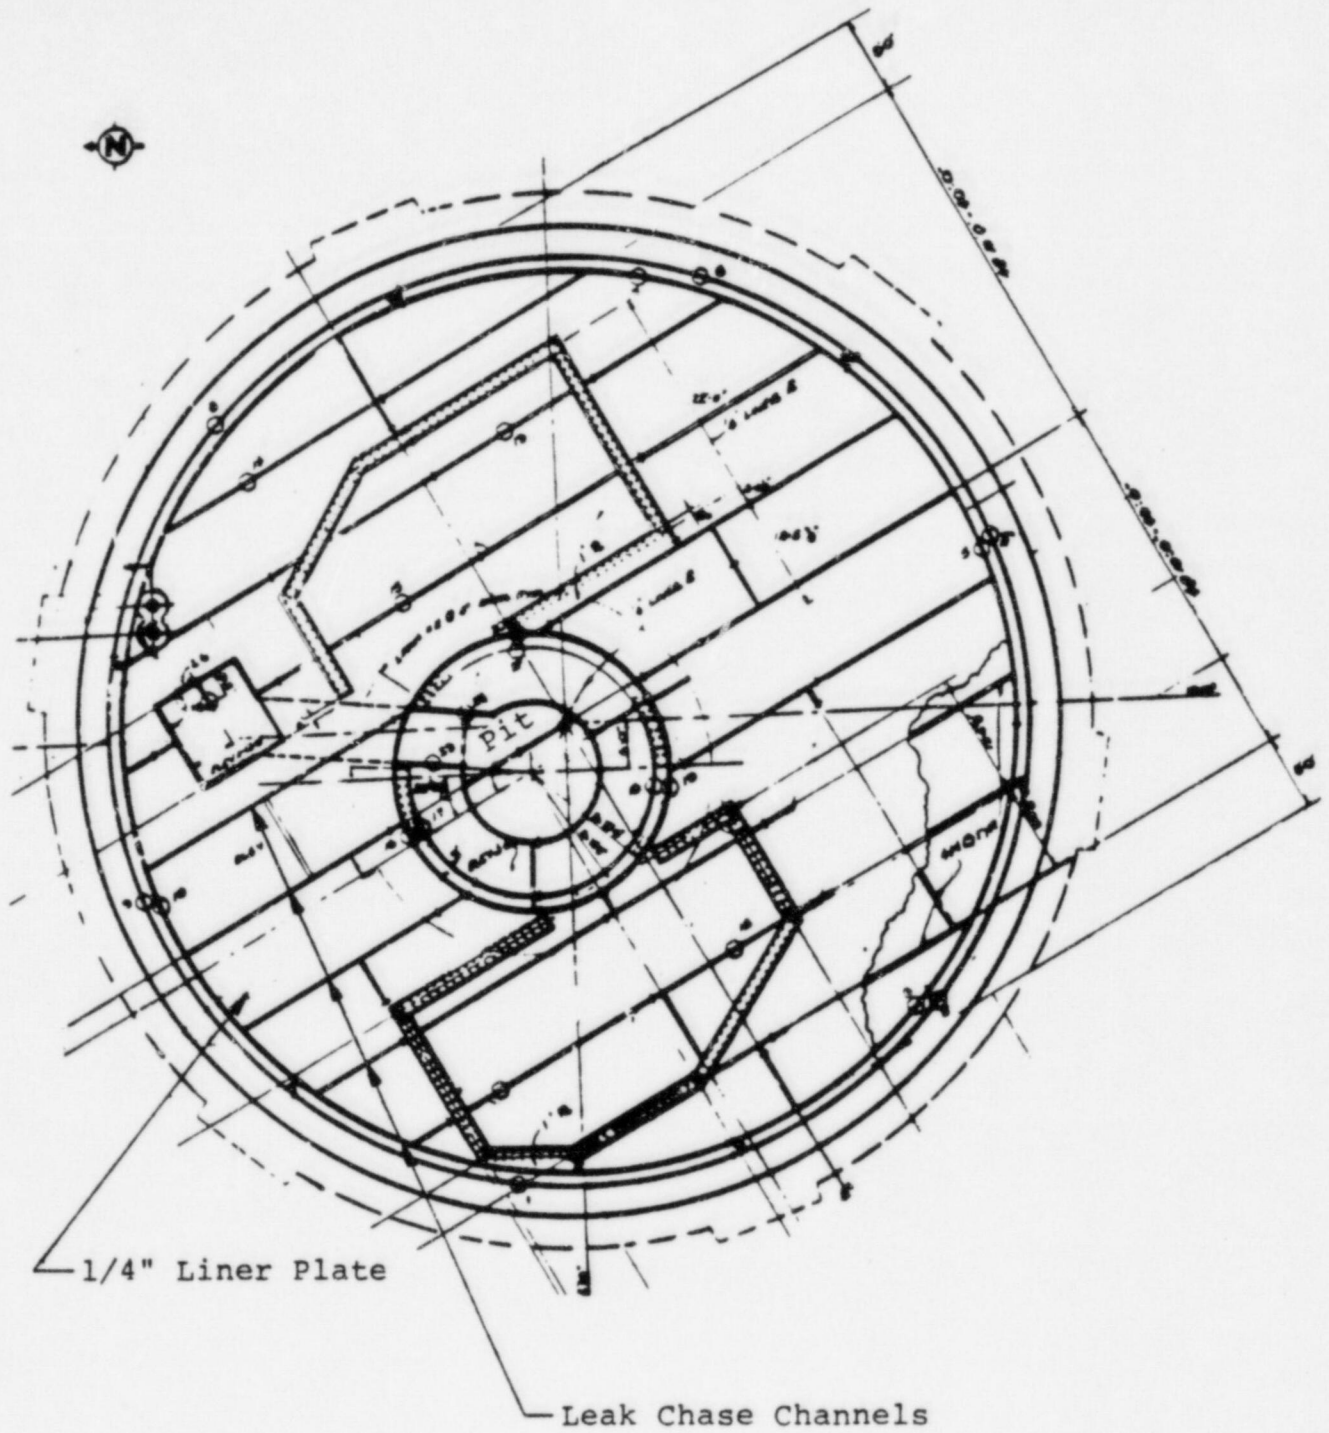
Leak Chase Channel and Seal Weld Location in Base Liner Plate
